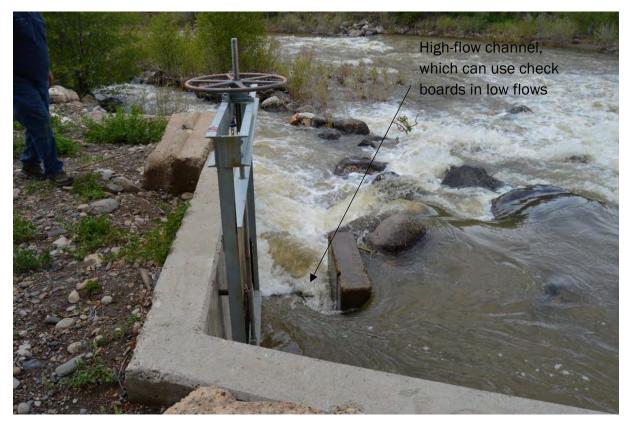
Concrete Headwall with High Flow Channel at Paonia Ditch Intake Structure
